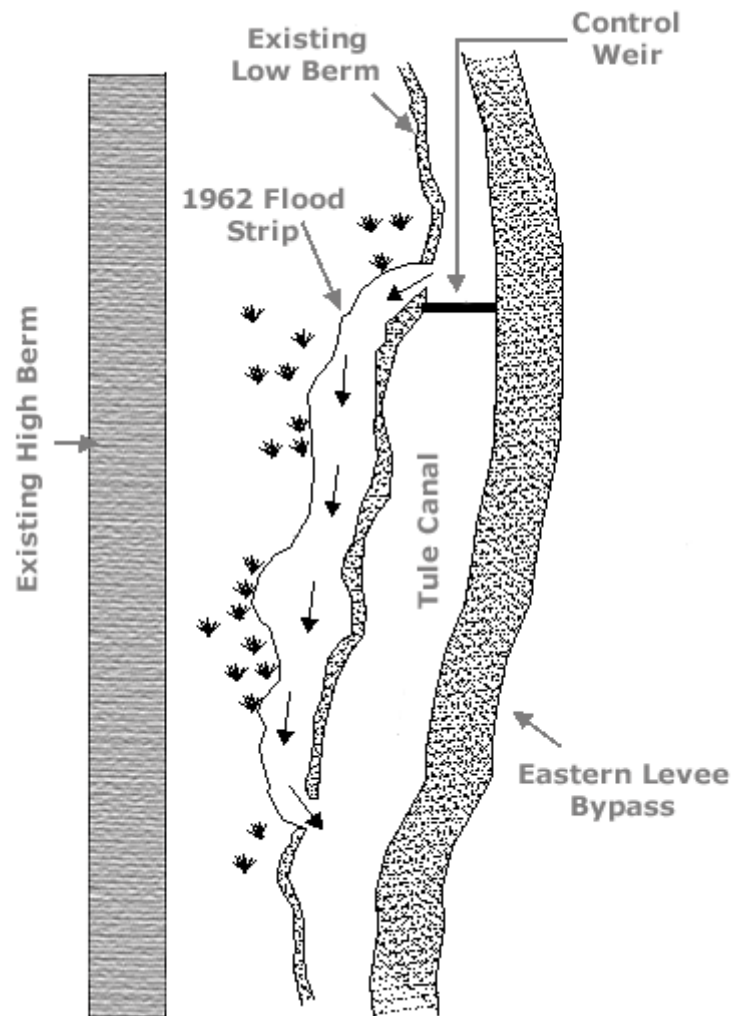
Schematic of 1962 Flood Strip Site Concept
